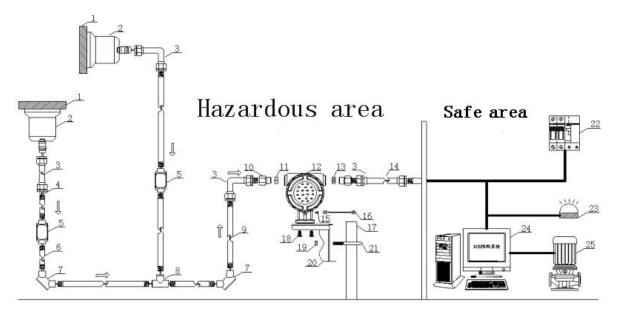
Schematic Diagram of Pipeline Connection for Level Meter Installation
